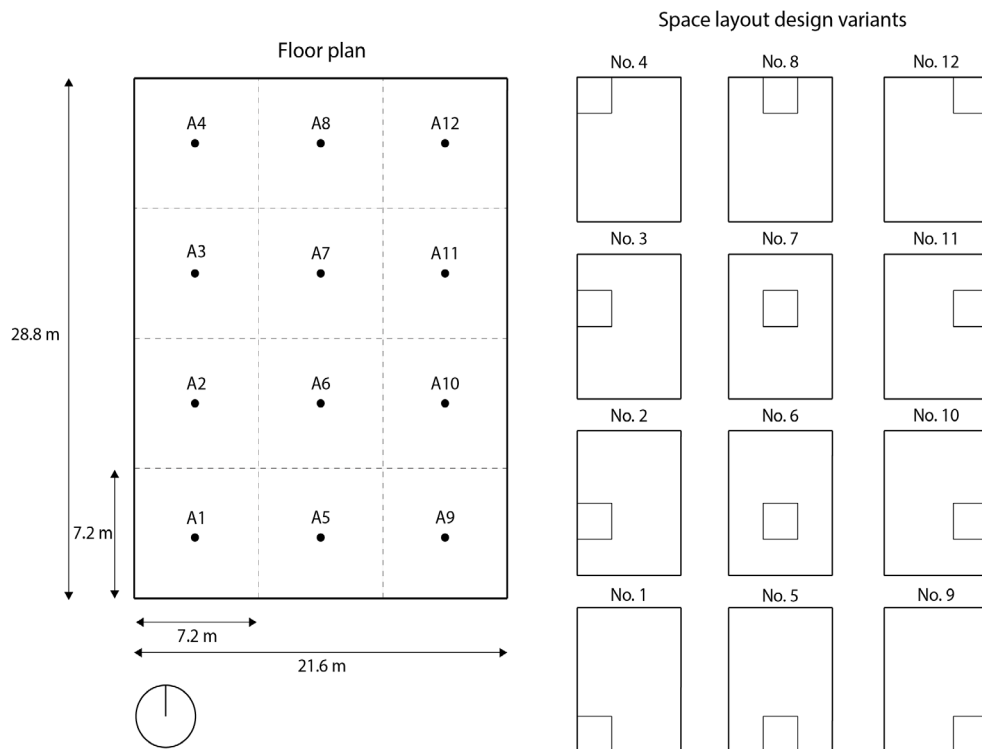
Floor plan with façade grid and space layout design variants no. 1–12
